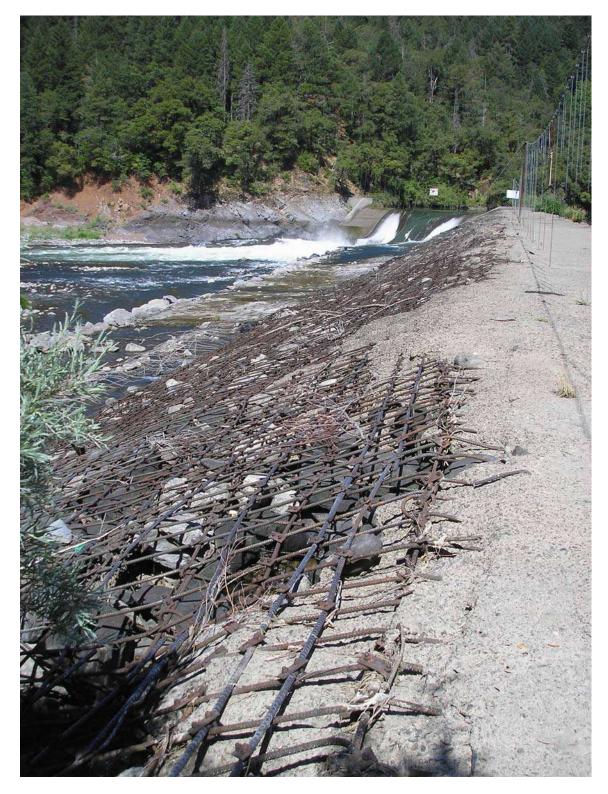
Pit No. 7 Afterbay Dam, looking at downstream face, toward right abutment spillway. Dam crest has been capped with concrete. (Reclamation, 2007, courtesy of Jared Vauk).
